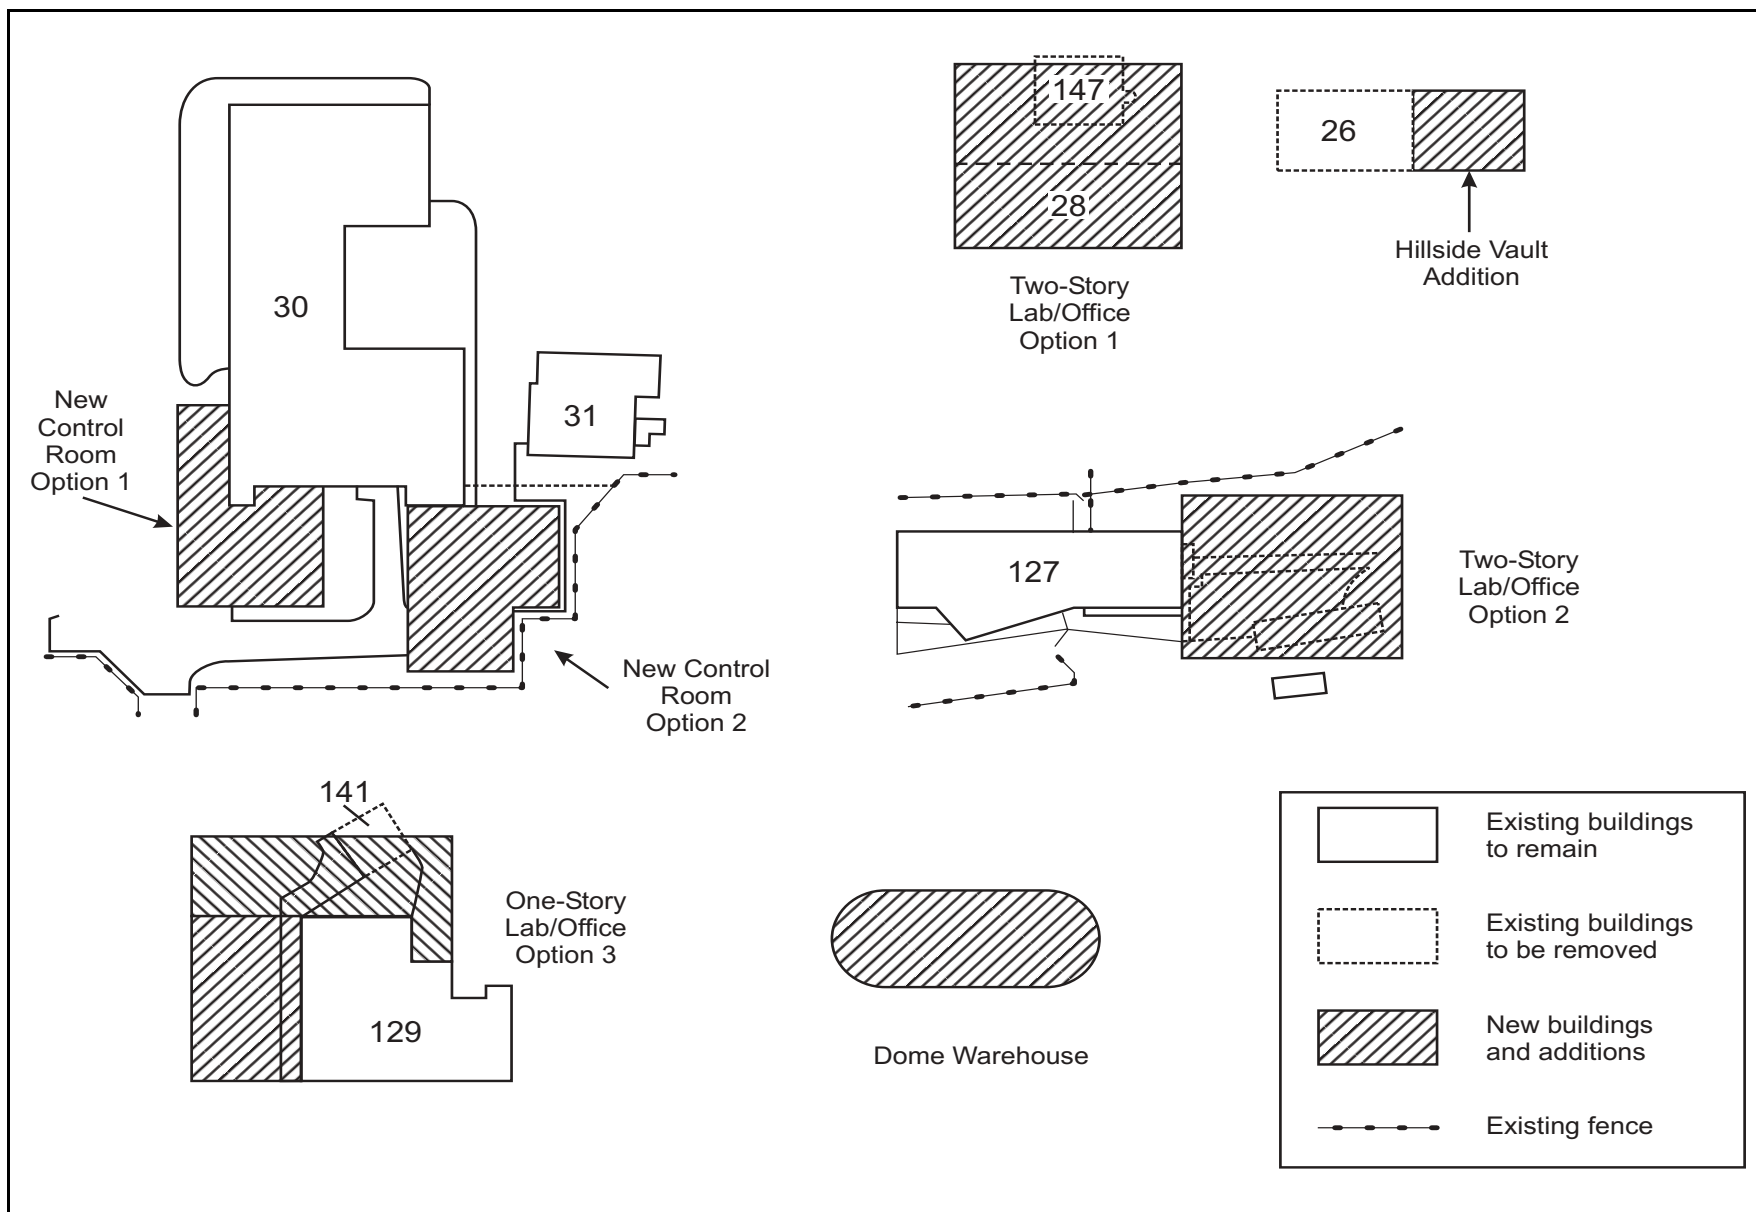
TA-18 Proposed New Construction (TA-18 Upgrade Alternative)
